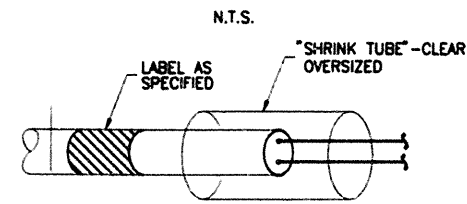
# DETAIL "B" - TYPICAL CABLE LABELING METHOD
